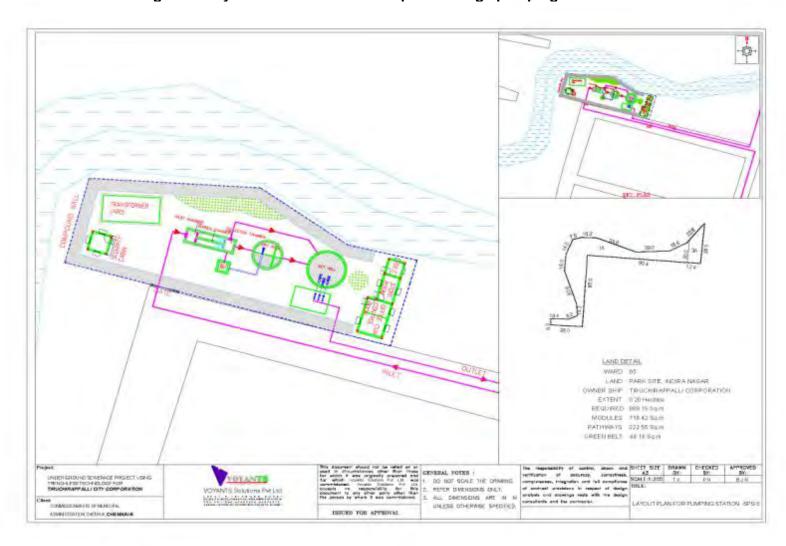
Layout Plan on Revenue Map for Sewage pumping stations 5
